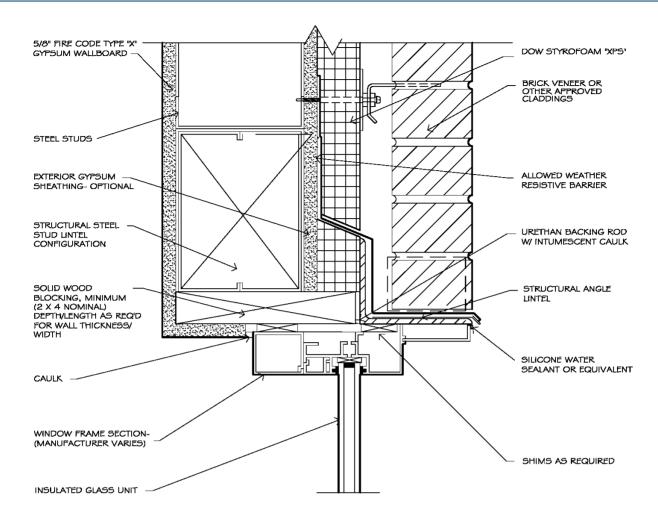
Window / Door Header Detail with FR Wood Blocking
